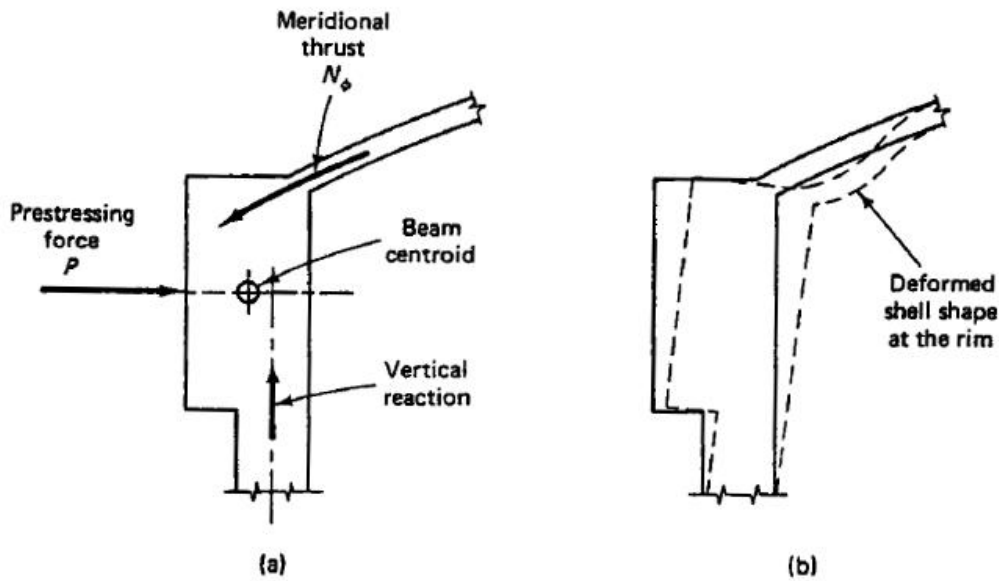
Edge ring beam monolithic with tank wall. (a) Thrust N_ϕ not passing through ring beam centroid—general case. (b) Shell deformed shape due to excessive prestressing.
